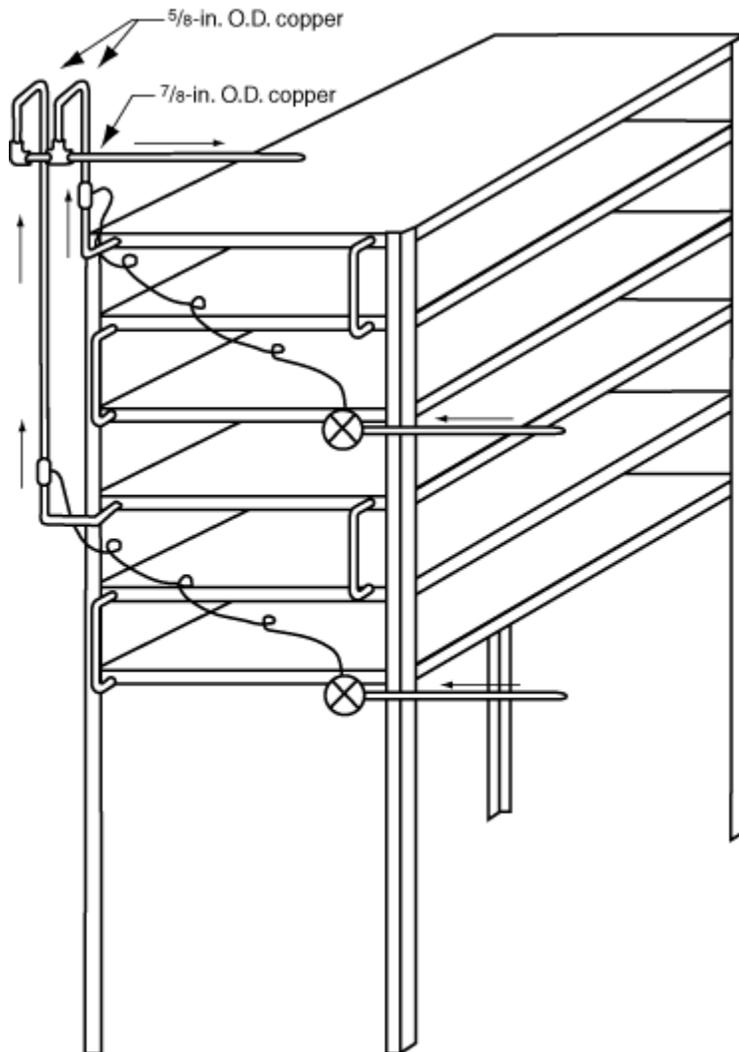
F10D Piping layout for two parallel banks of horizontal plate coils in rack.
